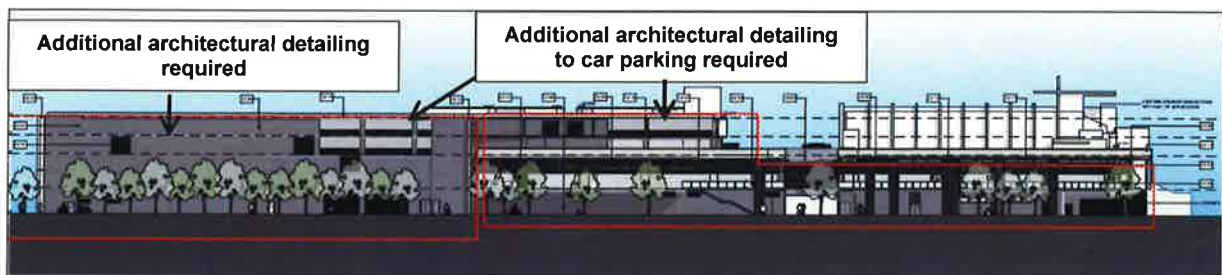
Northern Elevation - Woollooware Bay (Proposed MOD 7)
